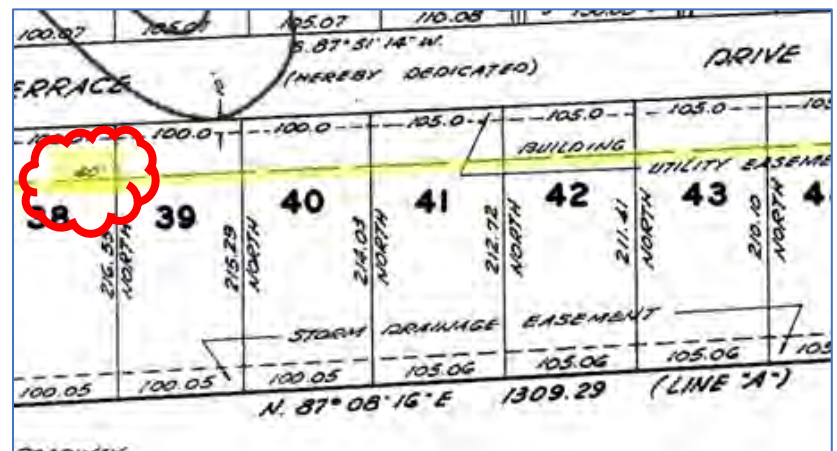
Gaslight Terrace Subdivision Plat showing the forty foot (40') building setback
